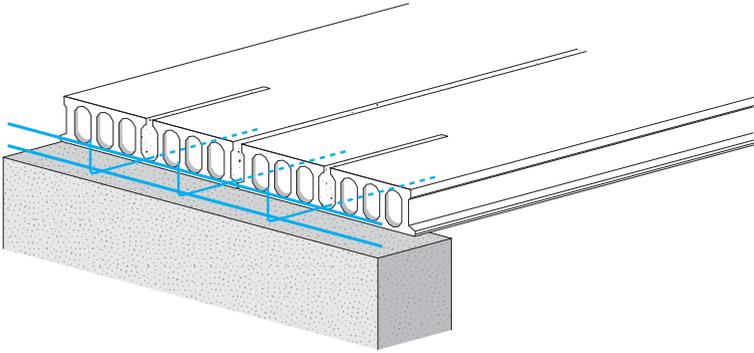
The reinforcement at the supports of the hollow core floor as for Art. 7.0.a of Italian Standard
